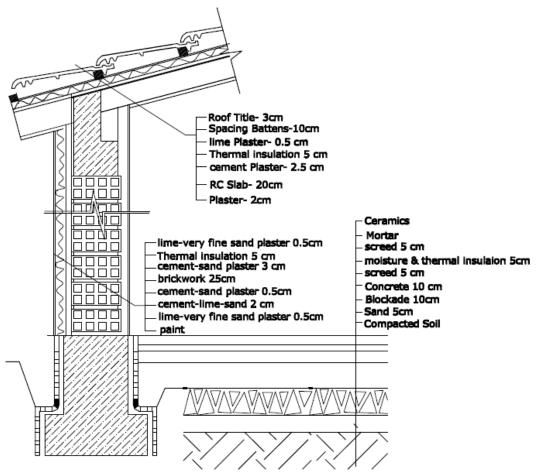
Construction Technique in Contemporary period- Brick wall- C2
